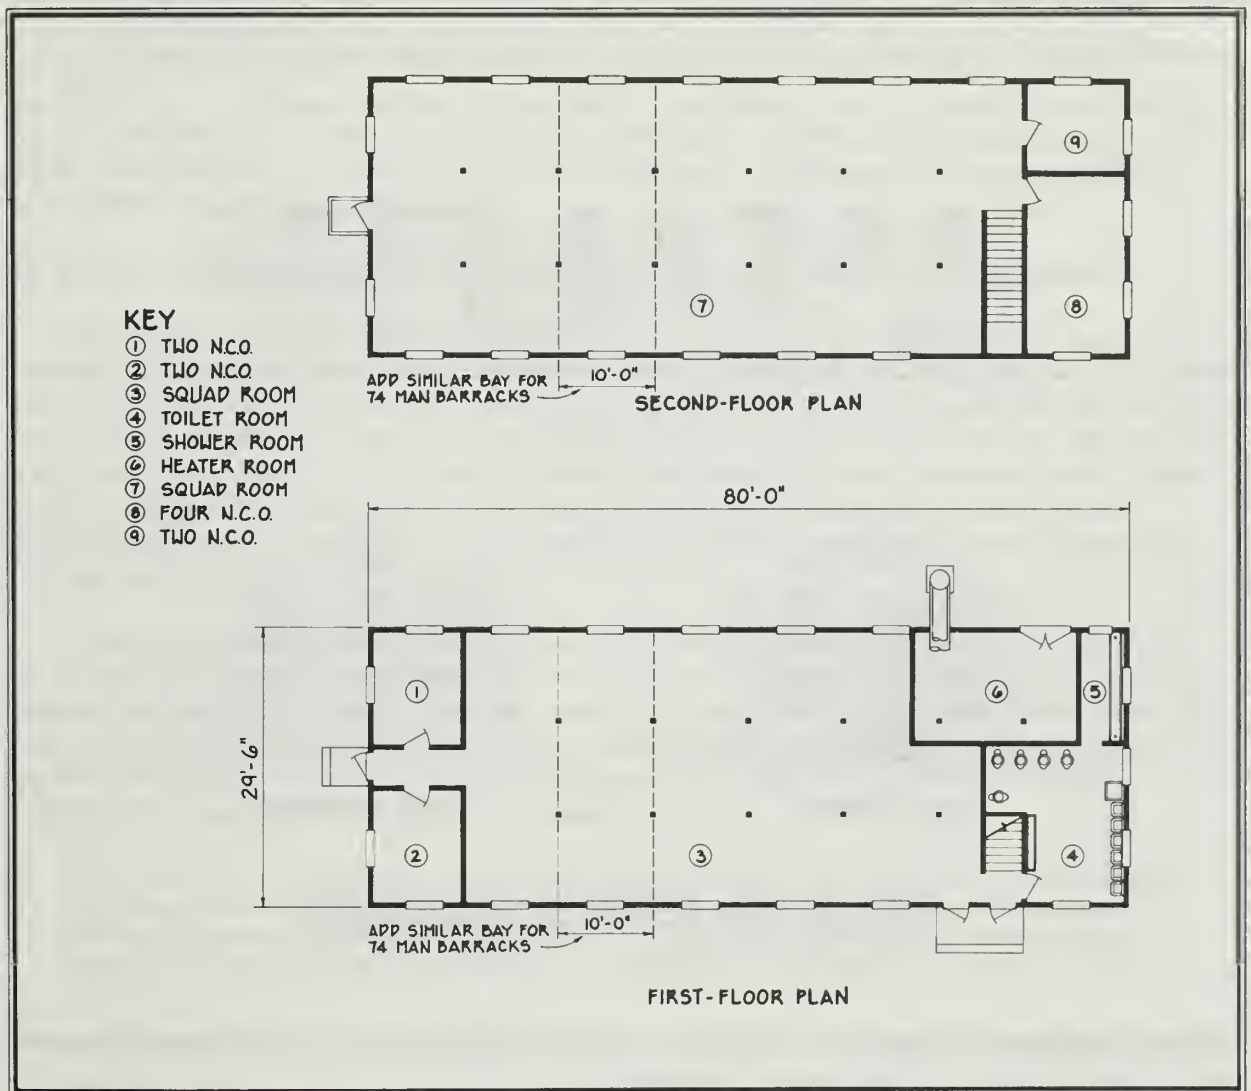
Floor plans of 45 & 63 Men Barracks - 700 Series.
